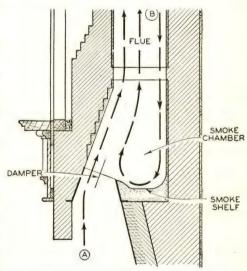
Section Detail of Fireplace Illustrating the Return of Downdrafts up the Flues
